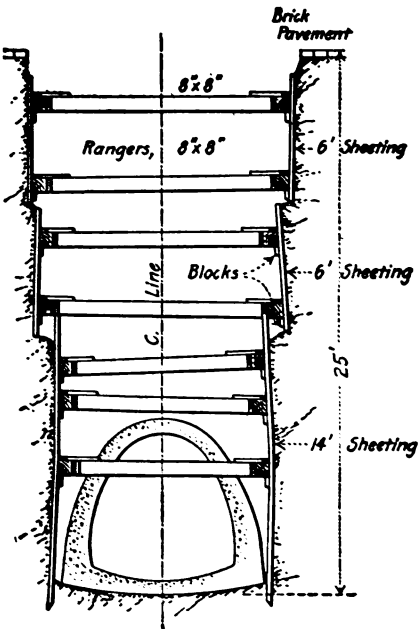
Poling boards and vertical sheeting for 7-ft. sewer.
